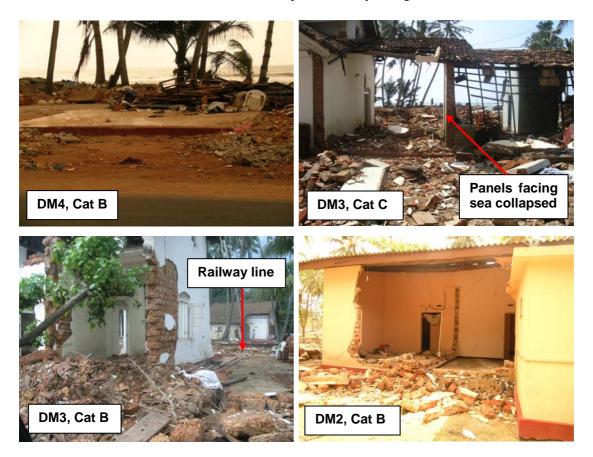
Damage to Cat. B and Cat. C masonry houses in Paiyagala, Sri Lanka
